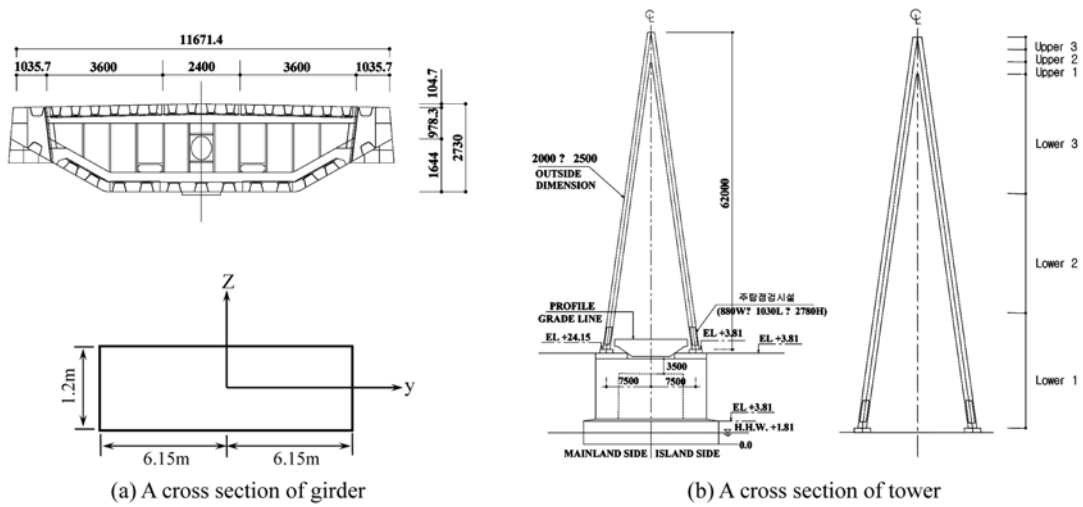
Girders and towers in the Dolsan Grand Bridge.
